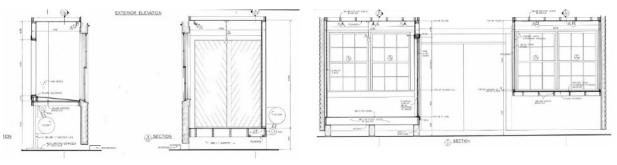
Biggs' Blacksmith Shop display window boxes, sections and elevations (Parks Canada, 1989)
